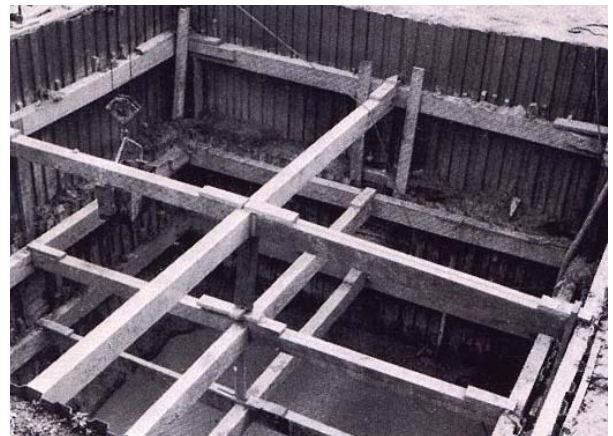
Fabricated excavation shoring - wooden struts and walers in combination with Trench sheets
